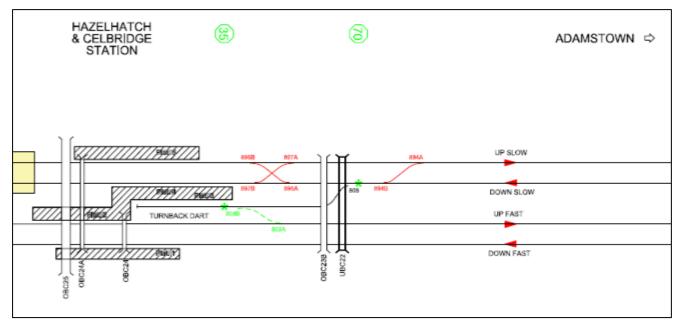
Hazelhatch & Celbridge Station – Schematic Track Plan (in red trackwork within this project)
